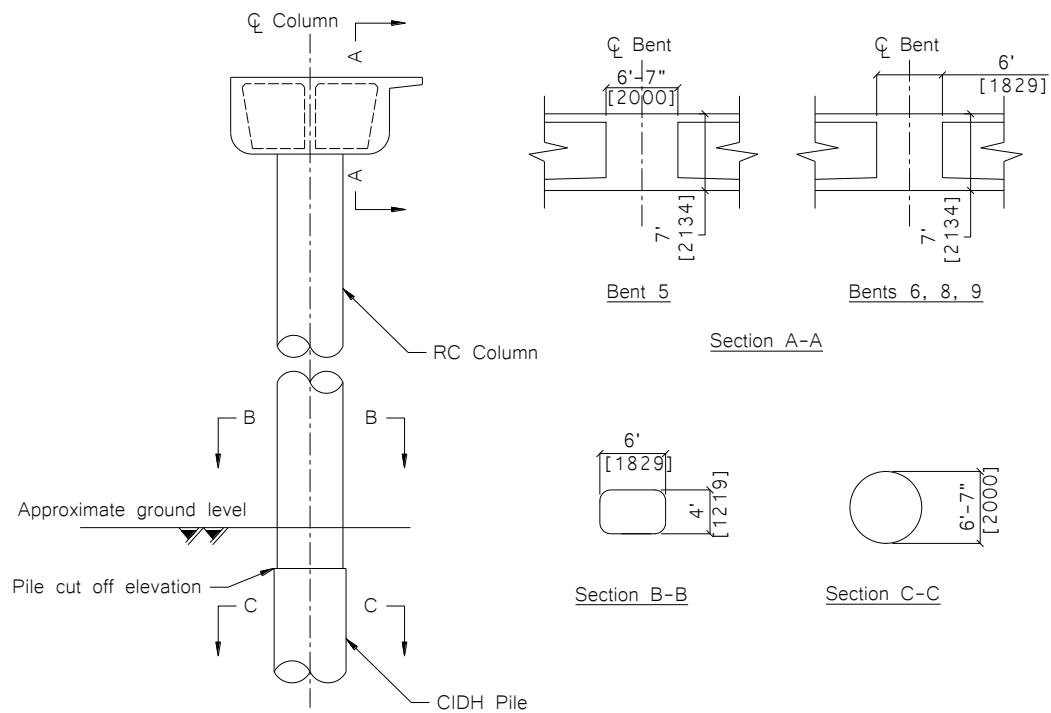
Typical bent layout of Frame 3 and 5, Bridge 5WB
